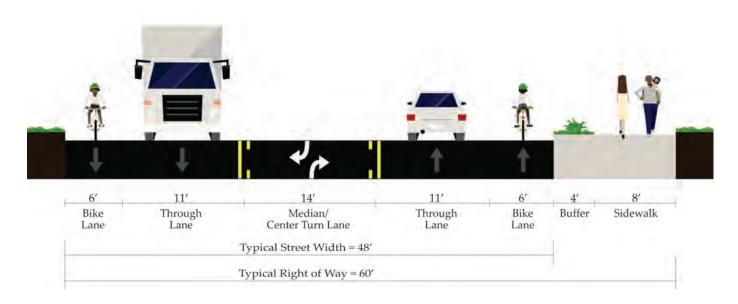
Recommended Cross-section for Constrained Segment of W Main Street
